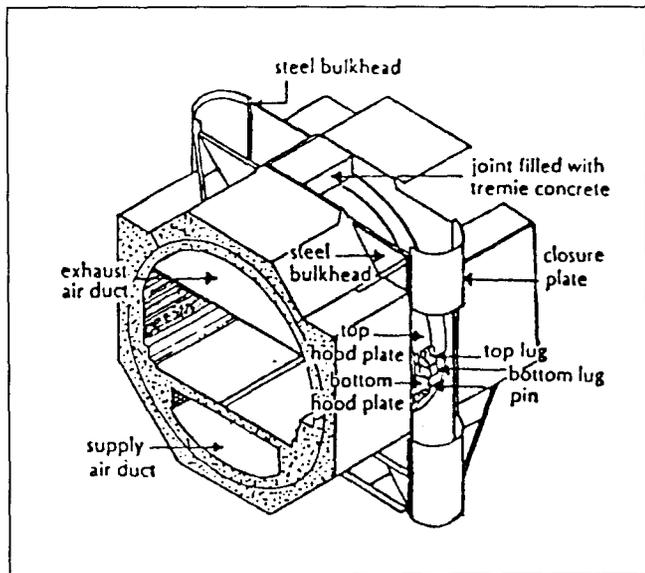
Typical tremie concrete joint for a double-shell steel tunnel.
